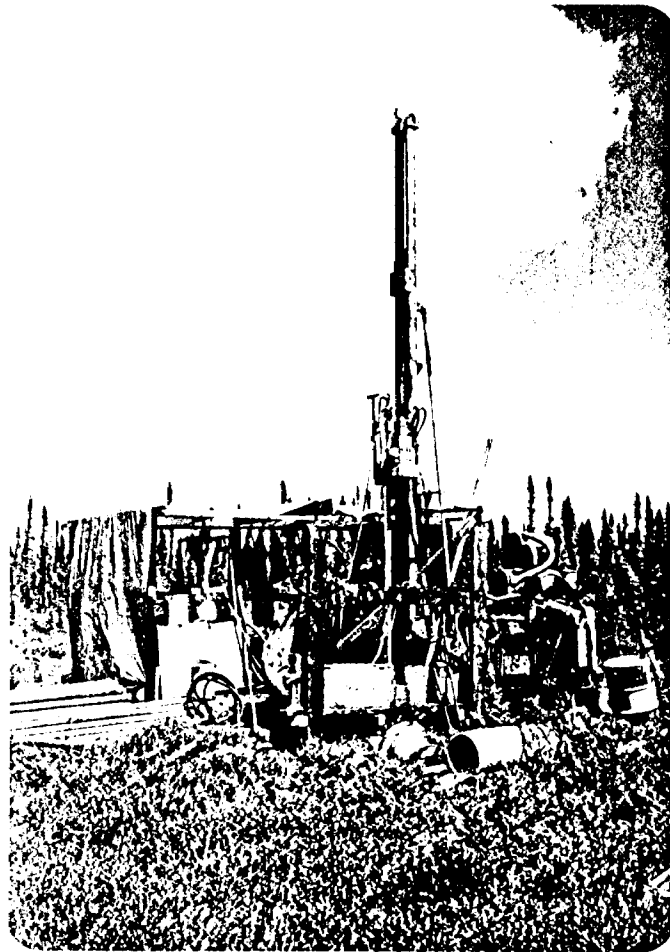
drill. This machine has been adapted to suit a helicopter-supported drill program.
